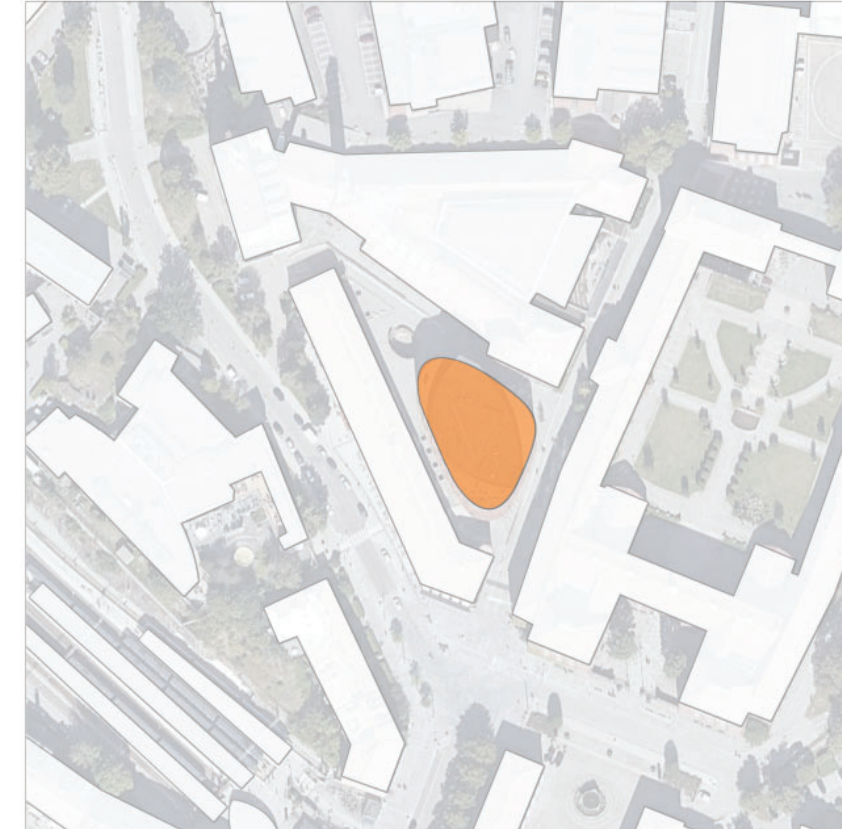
Site plan, KTH School of Architecture. Altered by authors.
